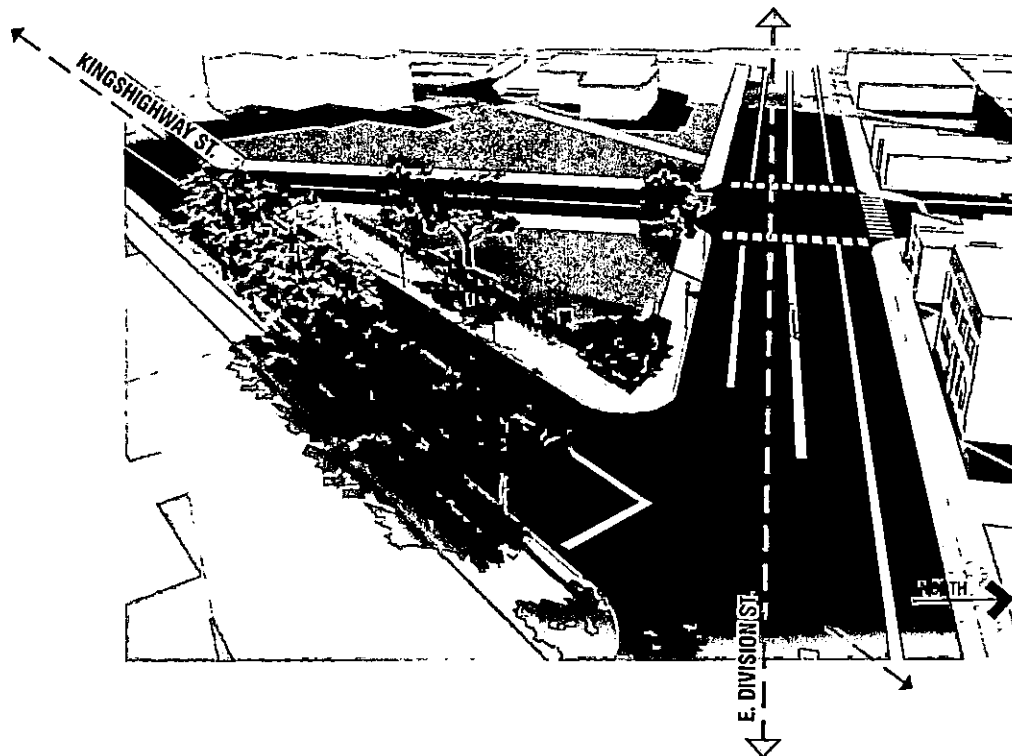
Potential enhanced Gateway Layout at Intersection of Kings Highway and Division Street
